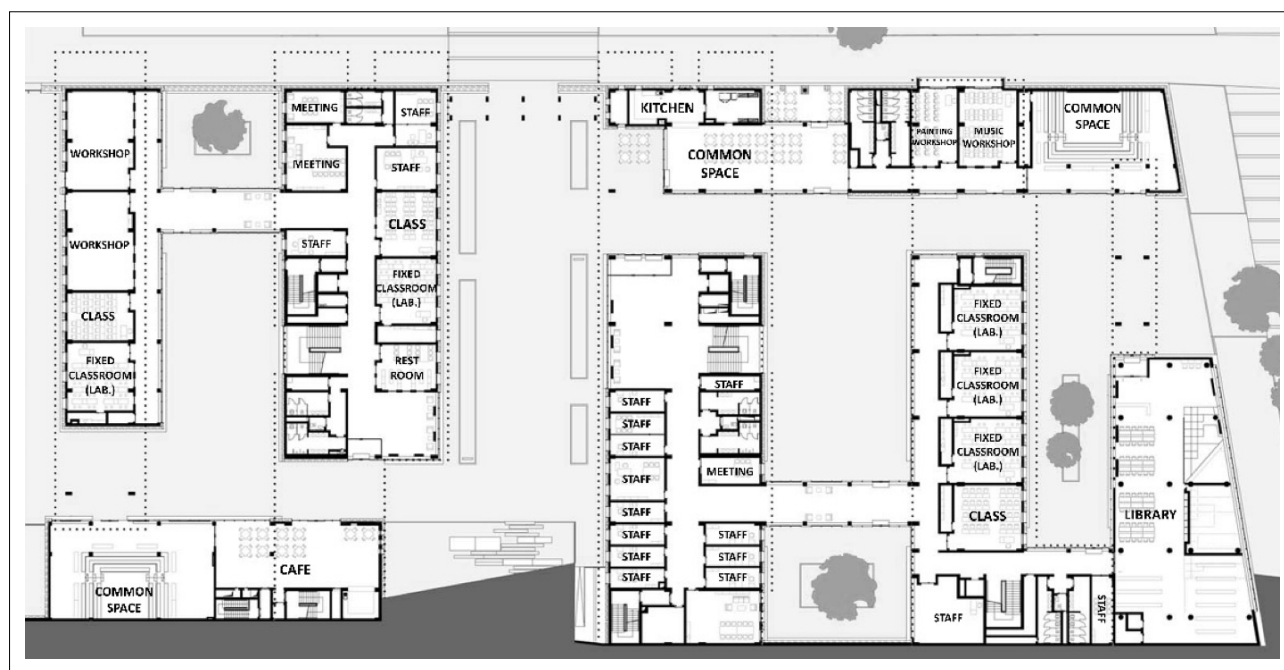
Ground floor plan (Adapted from Arkitera, 2019).
